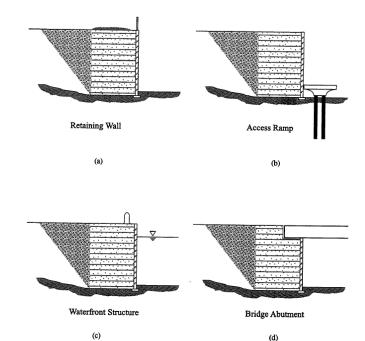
Representative MSE wall applications (a) retaining wall; (b) access ramp; (c) waterfront structure; and (d) bridge abutment.
